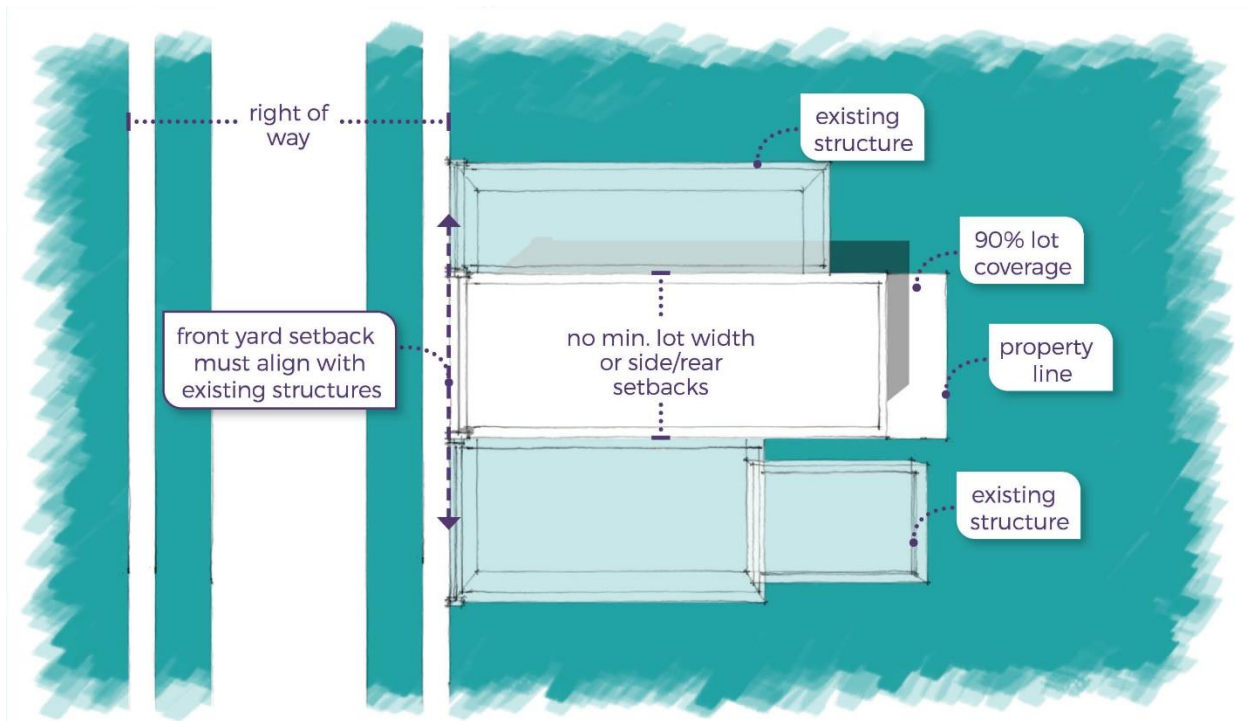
C-1 SITE DEVELOPMENT REQUIREMENTS
